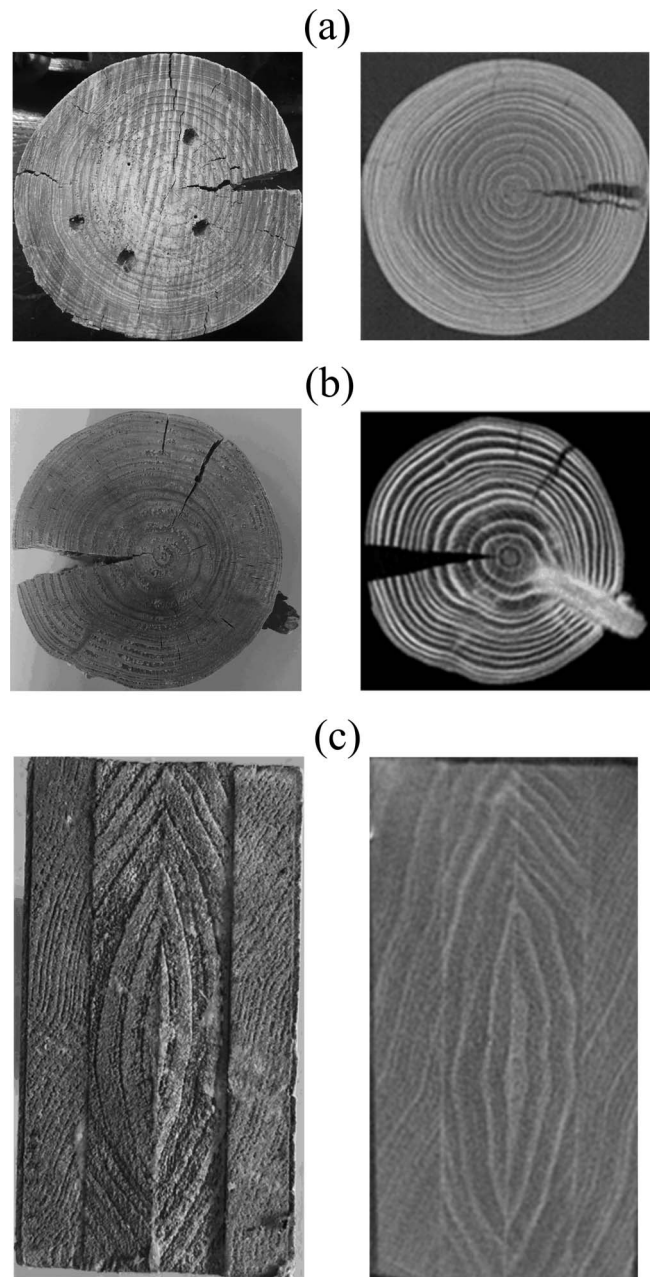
(Left) Photo and (right) reconstructed image of (a) Log No. 1, (b) Log No. 2, and (c) No. 3 laminated timber.
